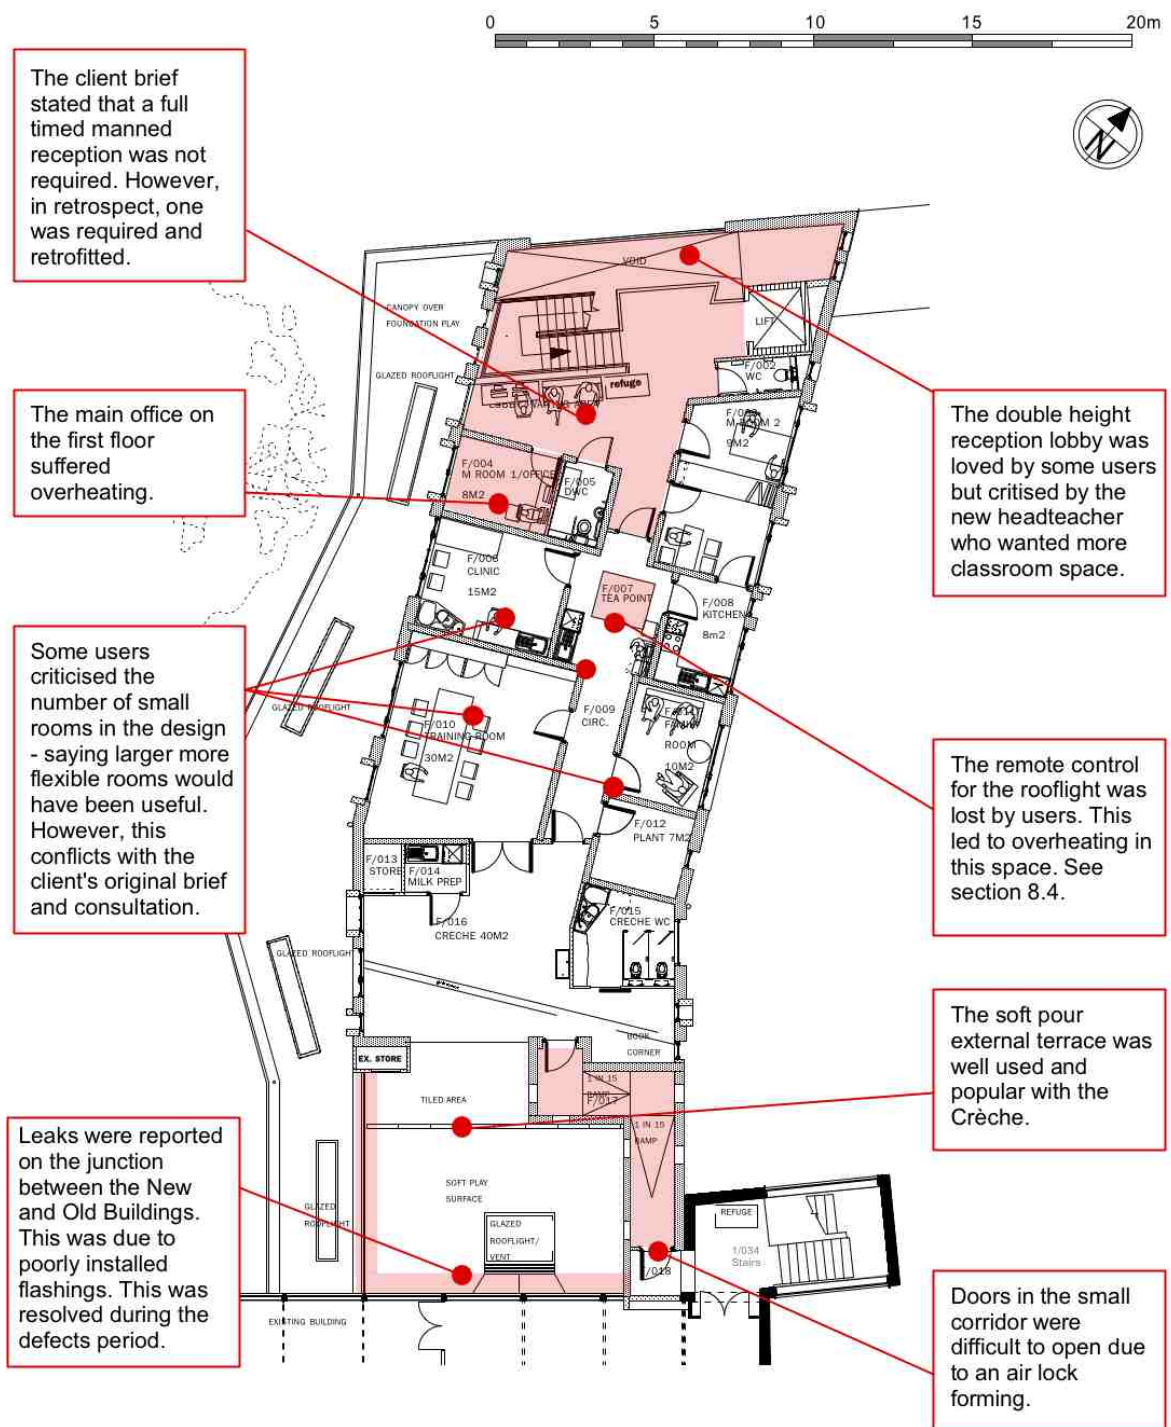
First Floor Plan of the New Building with commentary.
